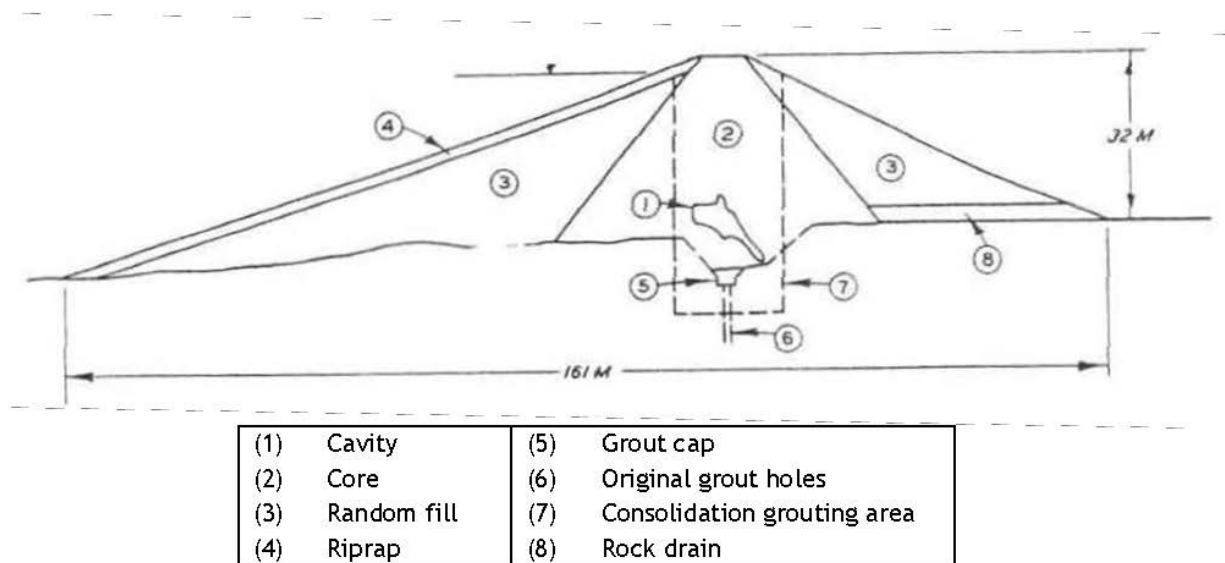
Section of East Branch Dam showing cavity (Bertram 1967).
